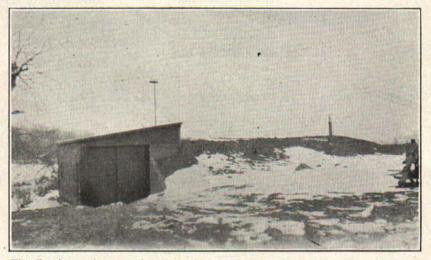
An underground cellar with driveway across one end. The small ventilating flue was found to be inadequate.
